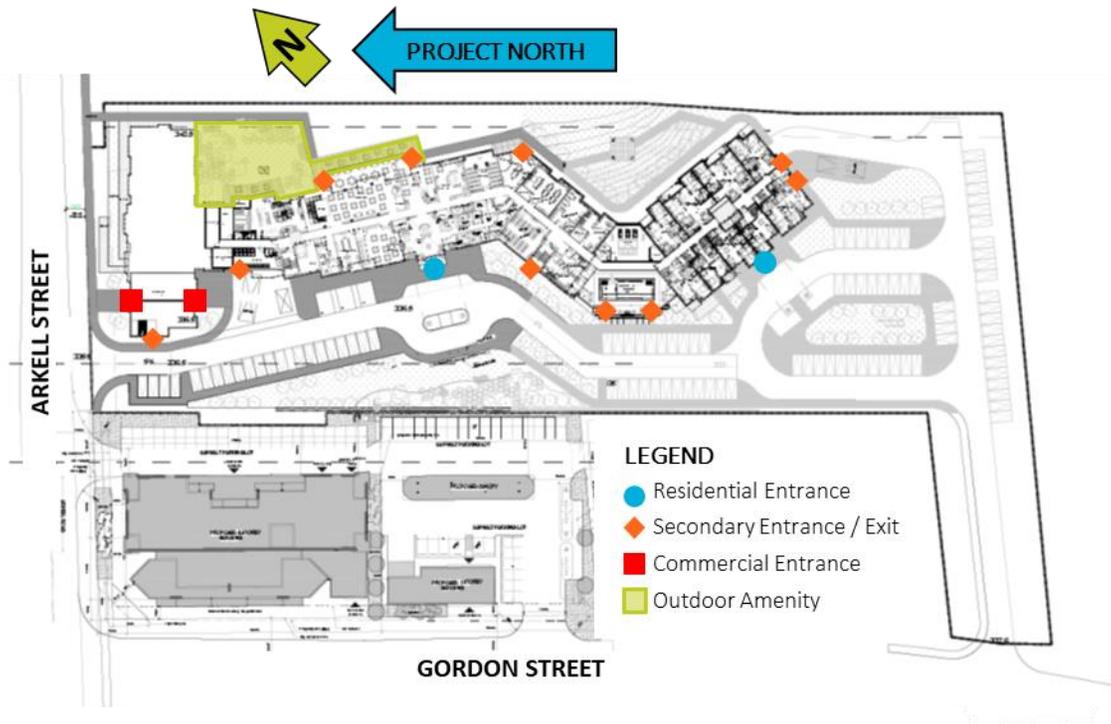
Site plan (December 2020, courtesy of IBI Group Architects)
